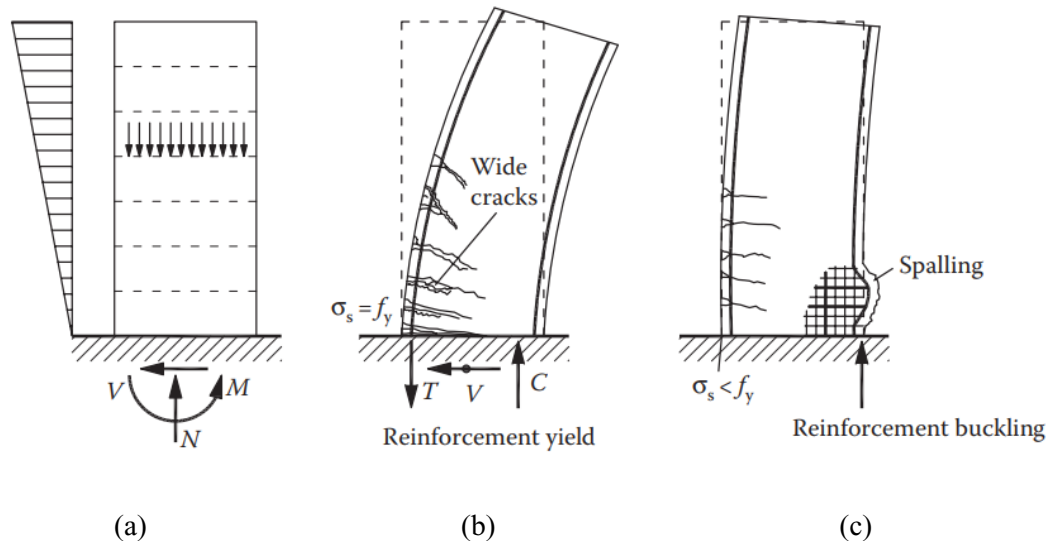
Flexural failure modes of slender walls: (a) loading patterns; (b) ductile failure; (c) brittle failure (Penelis & Penelis, 2014)
